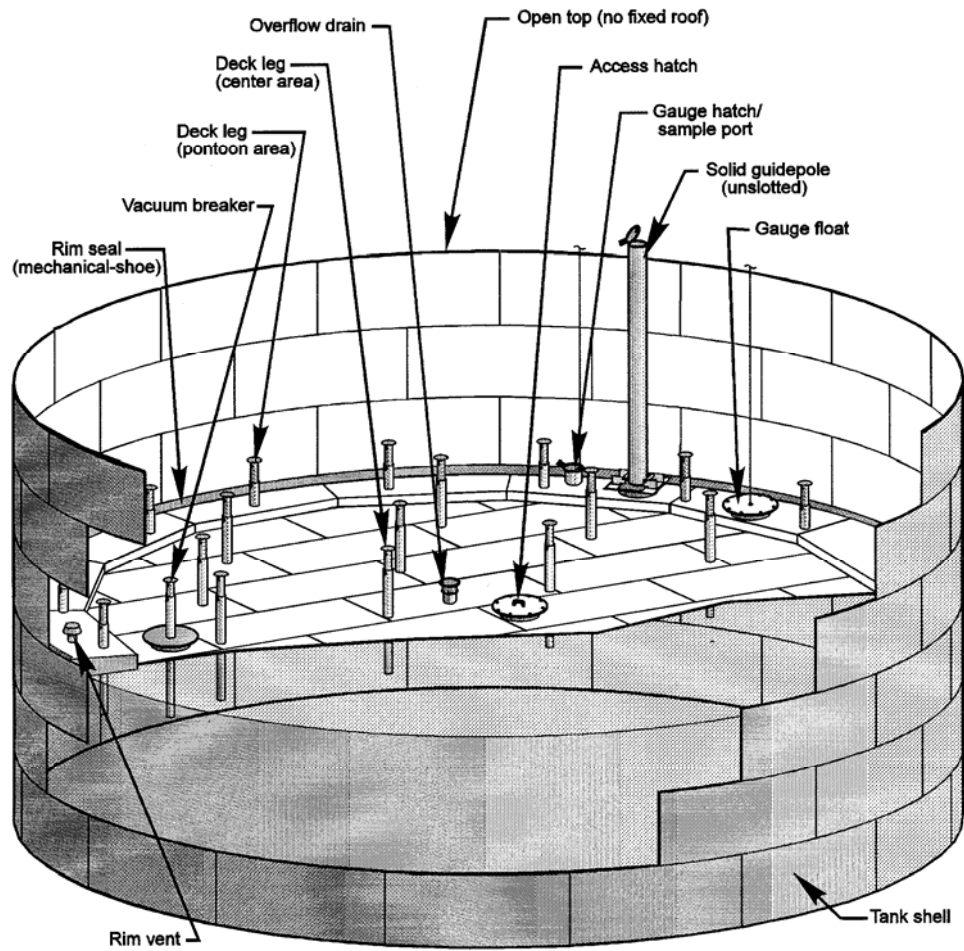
External floating roof tank (pontoon type).<sup>11</sup>
